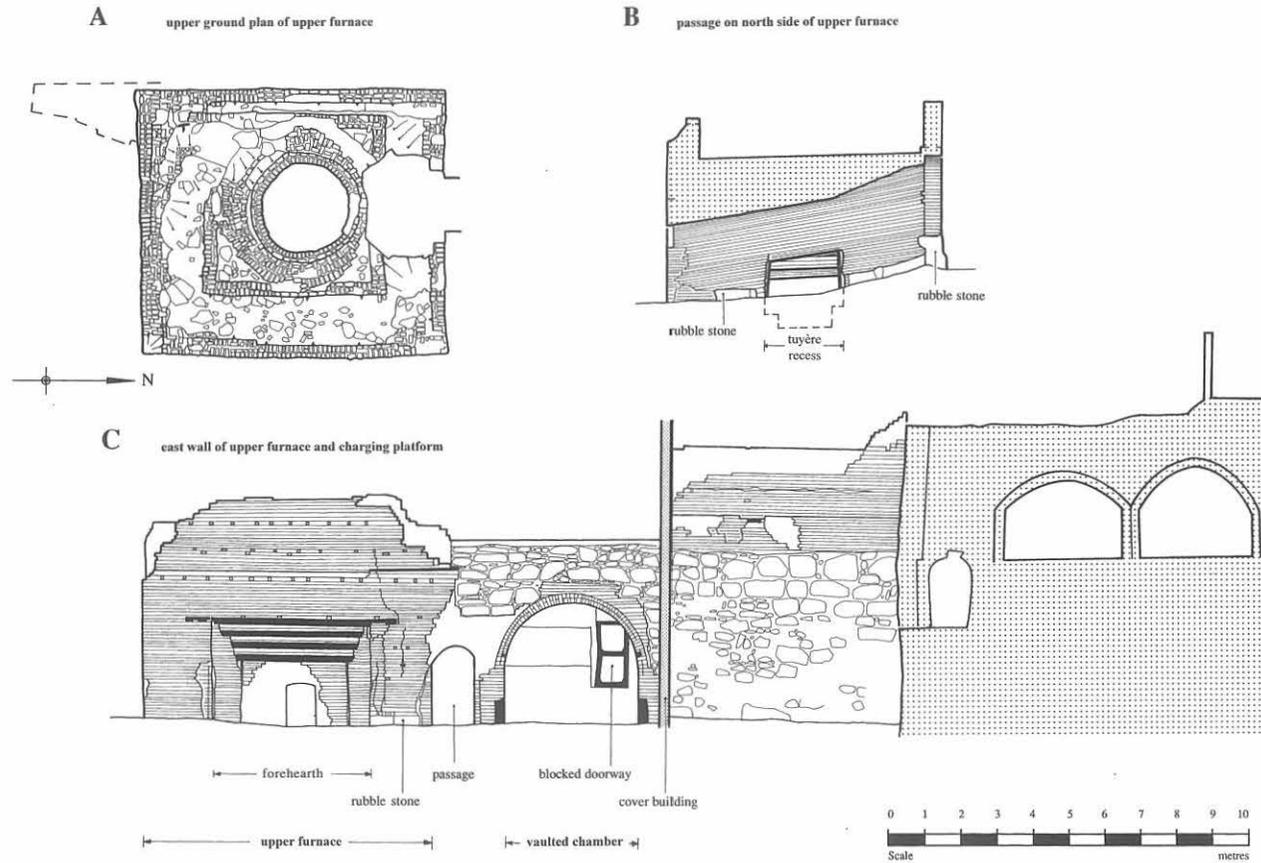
The upper ground plan of the upper furnace (A), shows exposed core work. The east elevation (C) of the upper furnace and charging platform shows the furnace forehearth and the vaulted chambers below the charging level. The north elevation (B) of the upper furnace, inside the passage behind the furnace, shows the inserted tuyère recess and rubble stonework of the original furnace.
